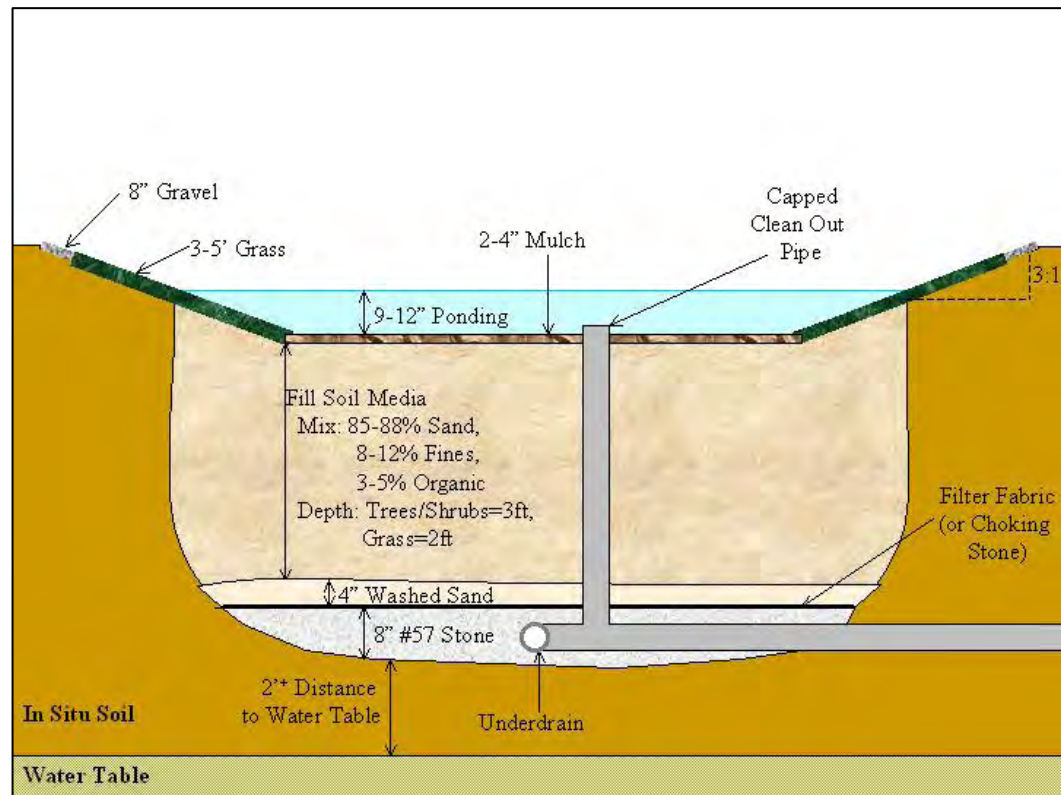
Bioretention Conceptual Layout: Cross-Section (Source: NCDENR)
